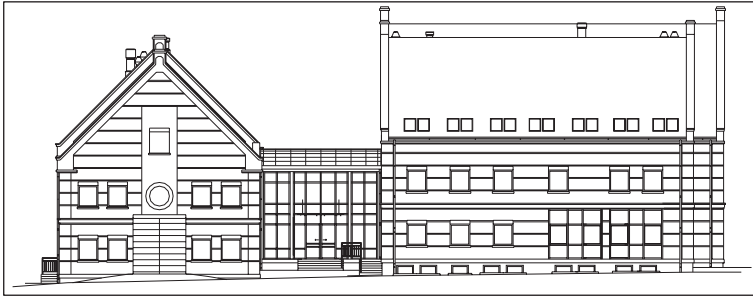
The west wall elevation. Author: M. ZAGROBA
